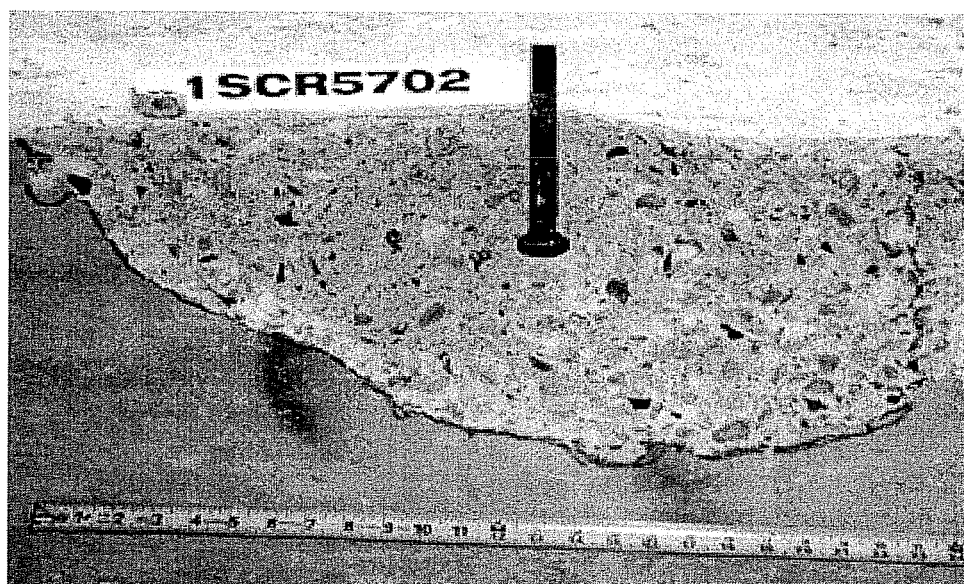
Typical Failure Cone for Cast-in-Place Single-Anchor Connection with No Hairpin Loaded in Shear
